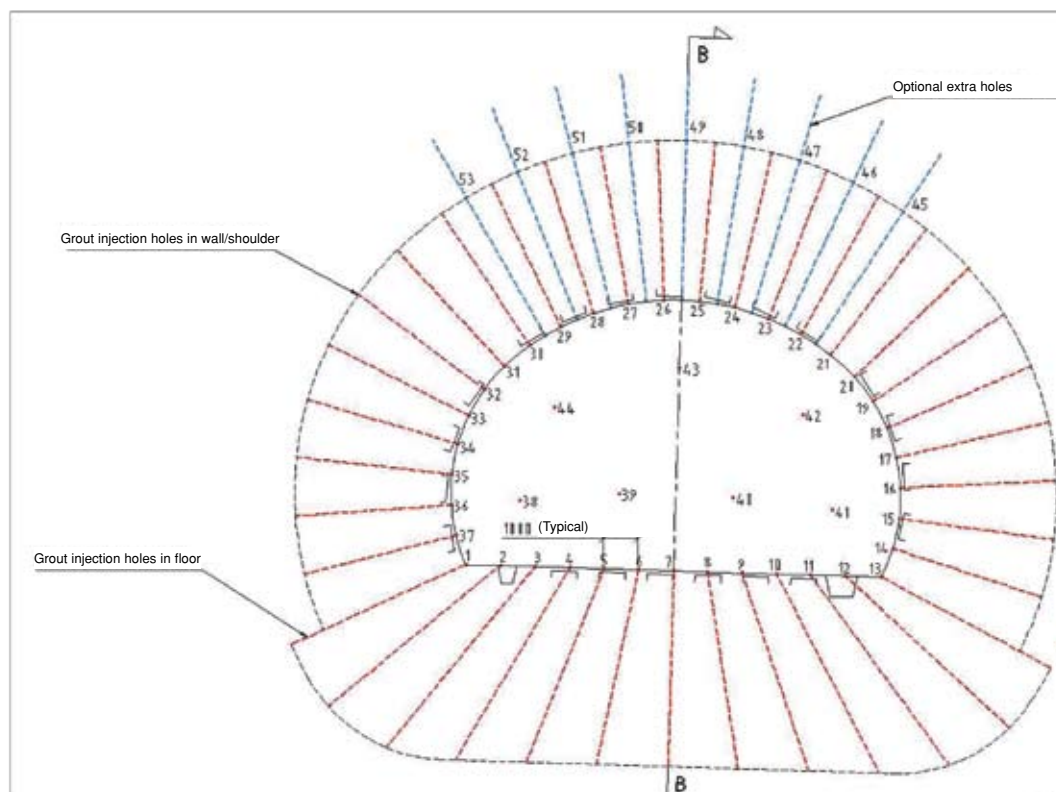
Example of a drilling plan for T9.5 profile of the Løren Tunnel
